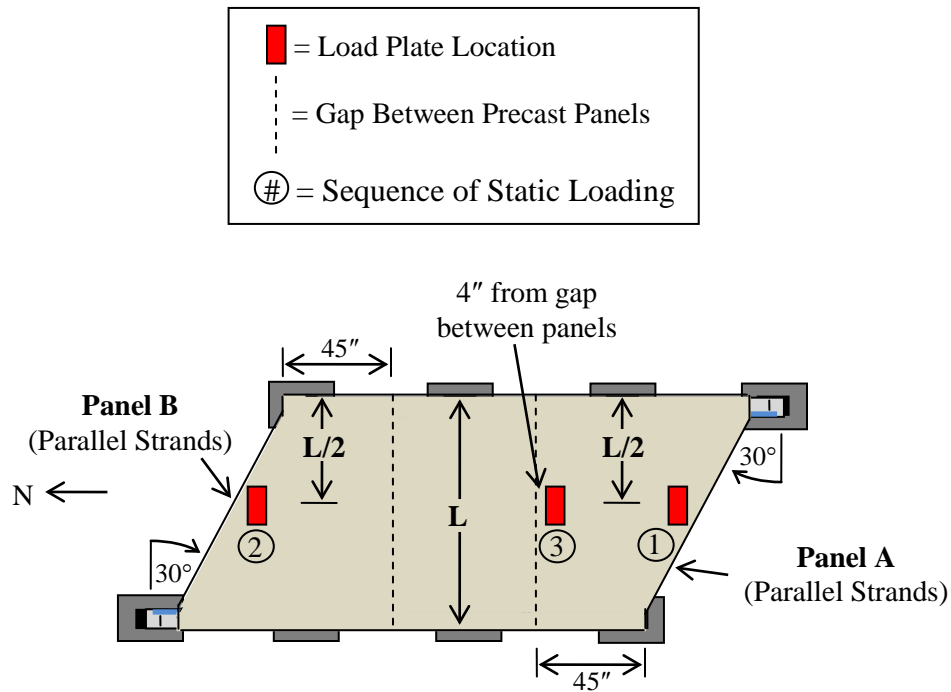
Location of Load Plates and Order of Loading for Specimen P30P3
